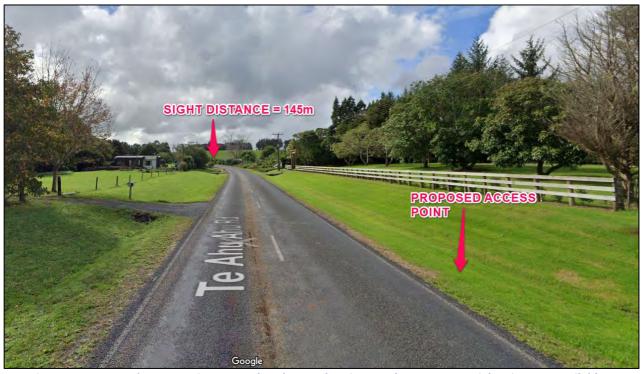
Proposed Access Point on Te Ahu Ahu Road Facing Northeast, ~145m Sight Distance Available.
